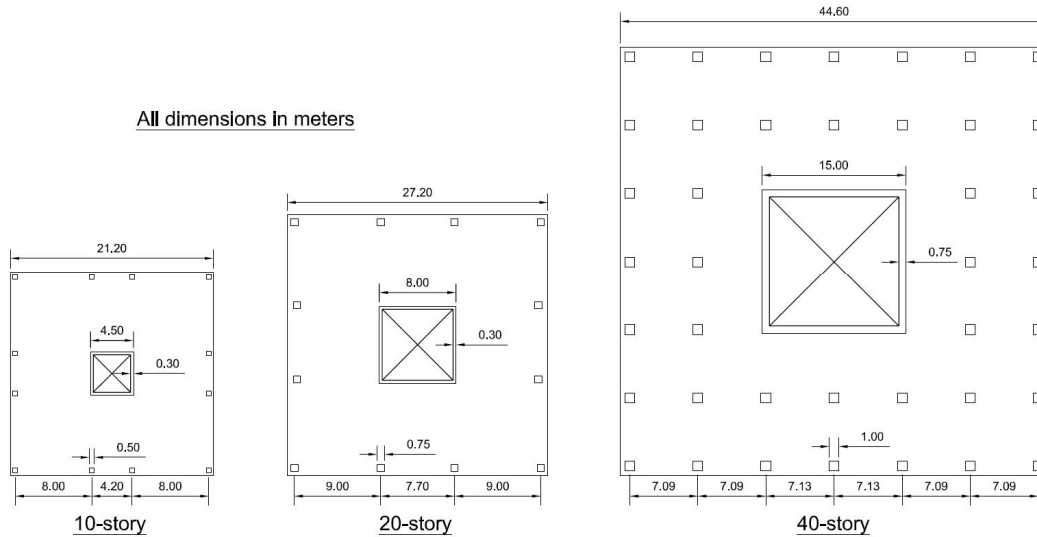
Floor plan-view of the 10-, 20-, and 40-story buildings.
